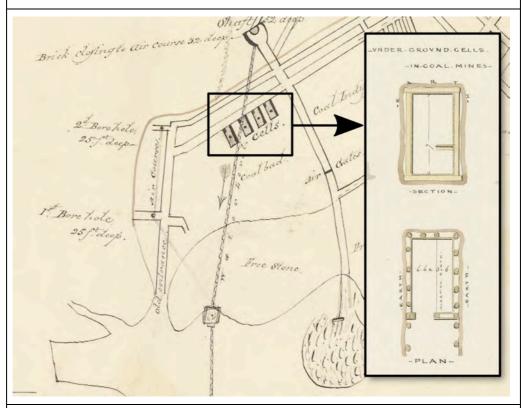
Detail of c.1837 mine plan showing location of underground cells, shown in insert
